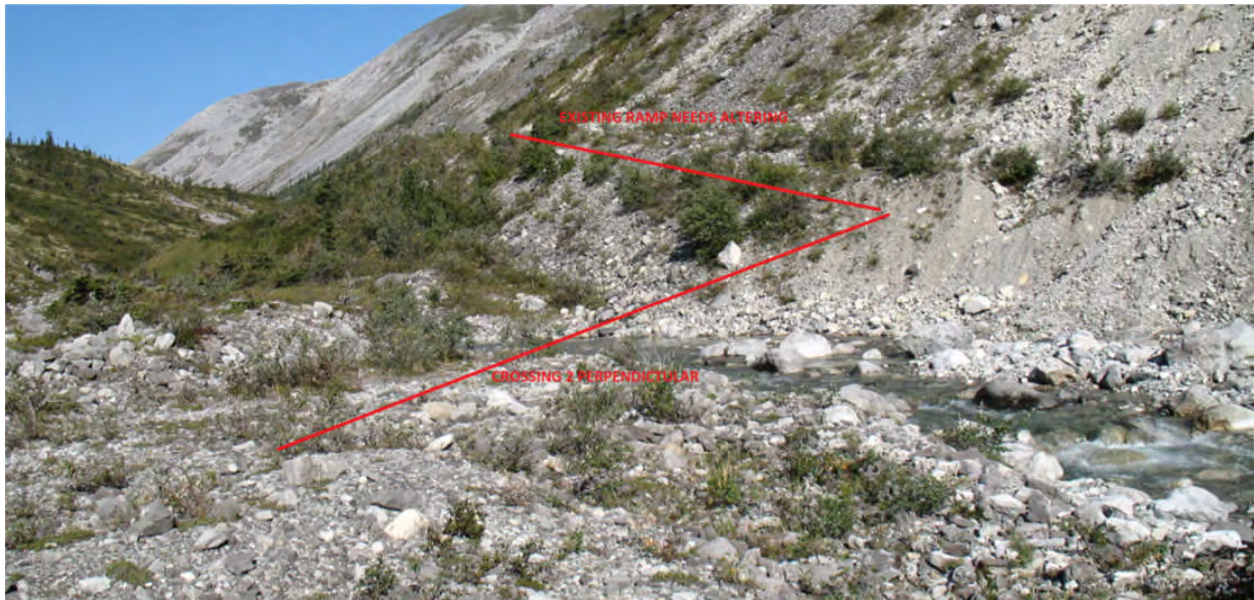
Sundog Temporary Crossing 2, Road KM 26.4. Viewing upstream.
